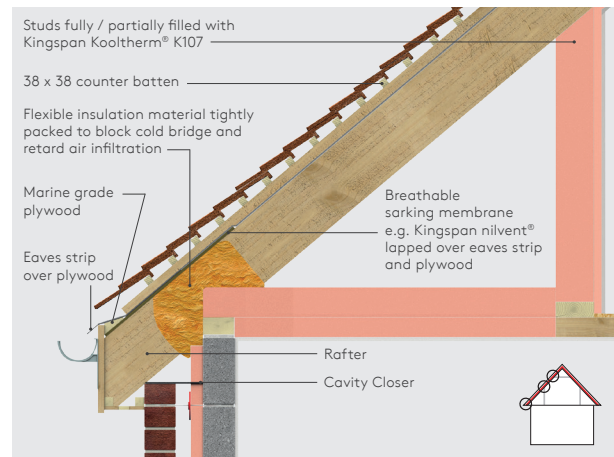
Overhanging eaves detail - section perpendicular to ridge
